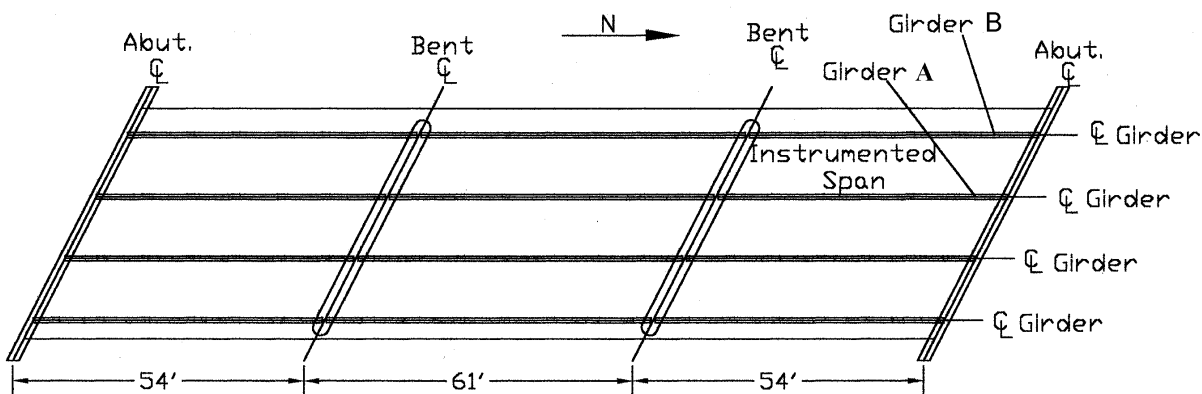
Plan view of the bridge indicating instrumented girder locations.
